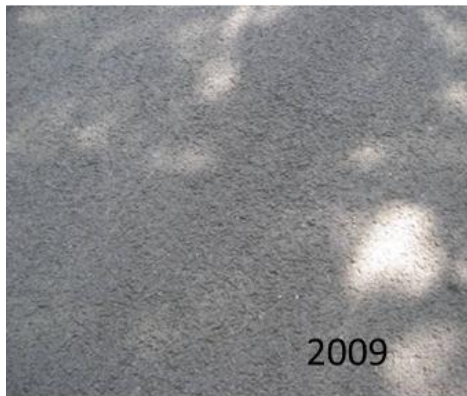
Paul St and Vintage Lane Pavement Surface Characteristics [UL-Islam 2010]
